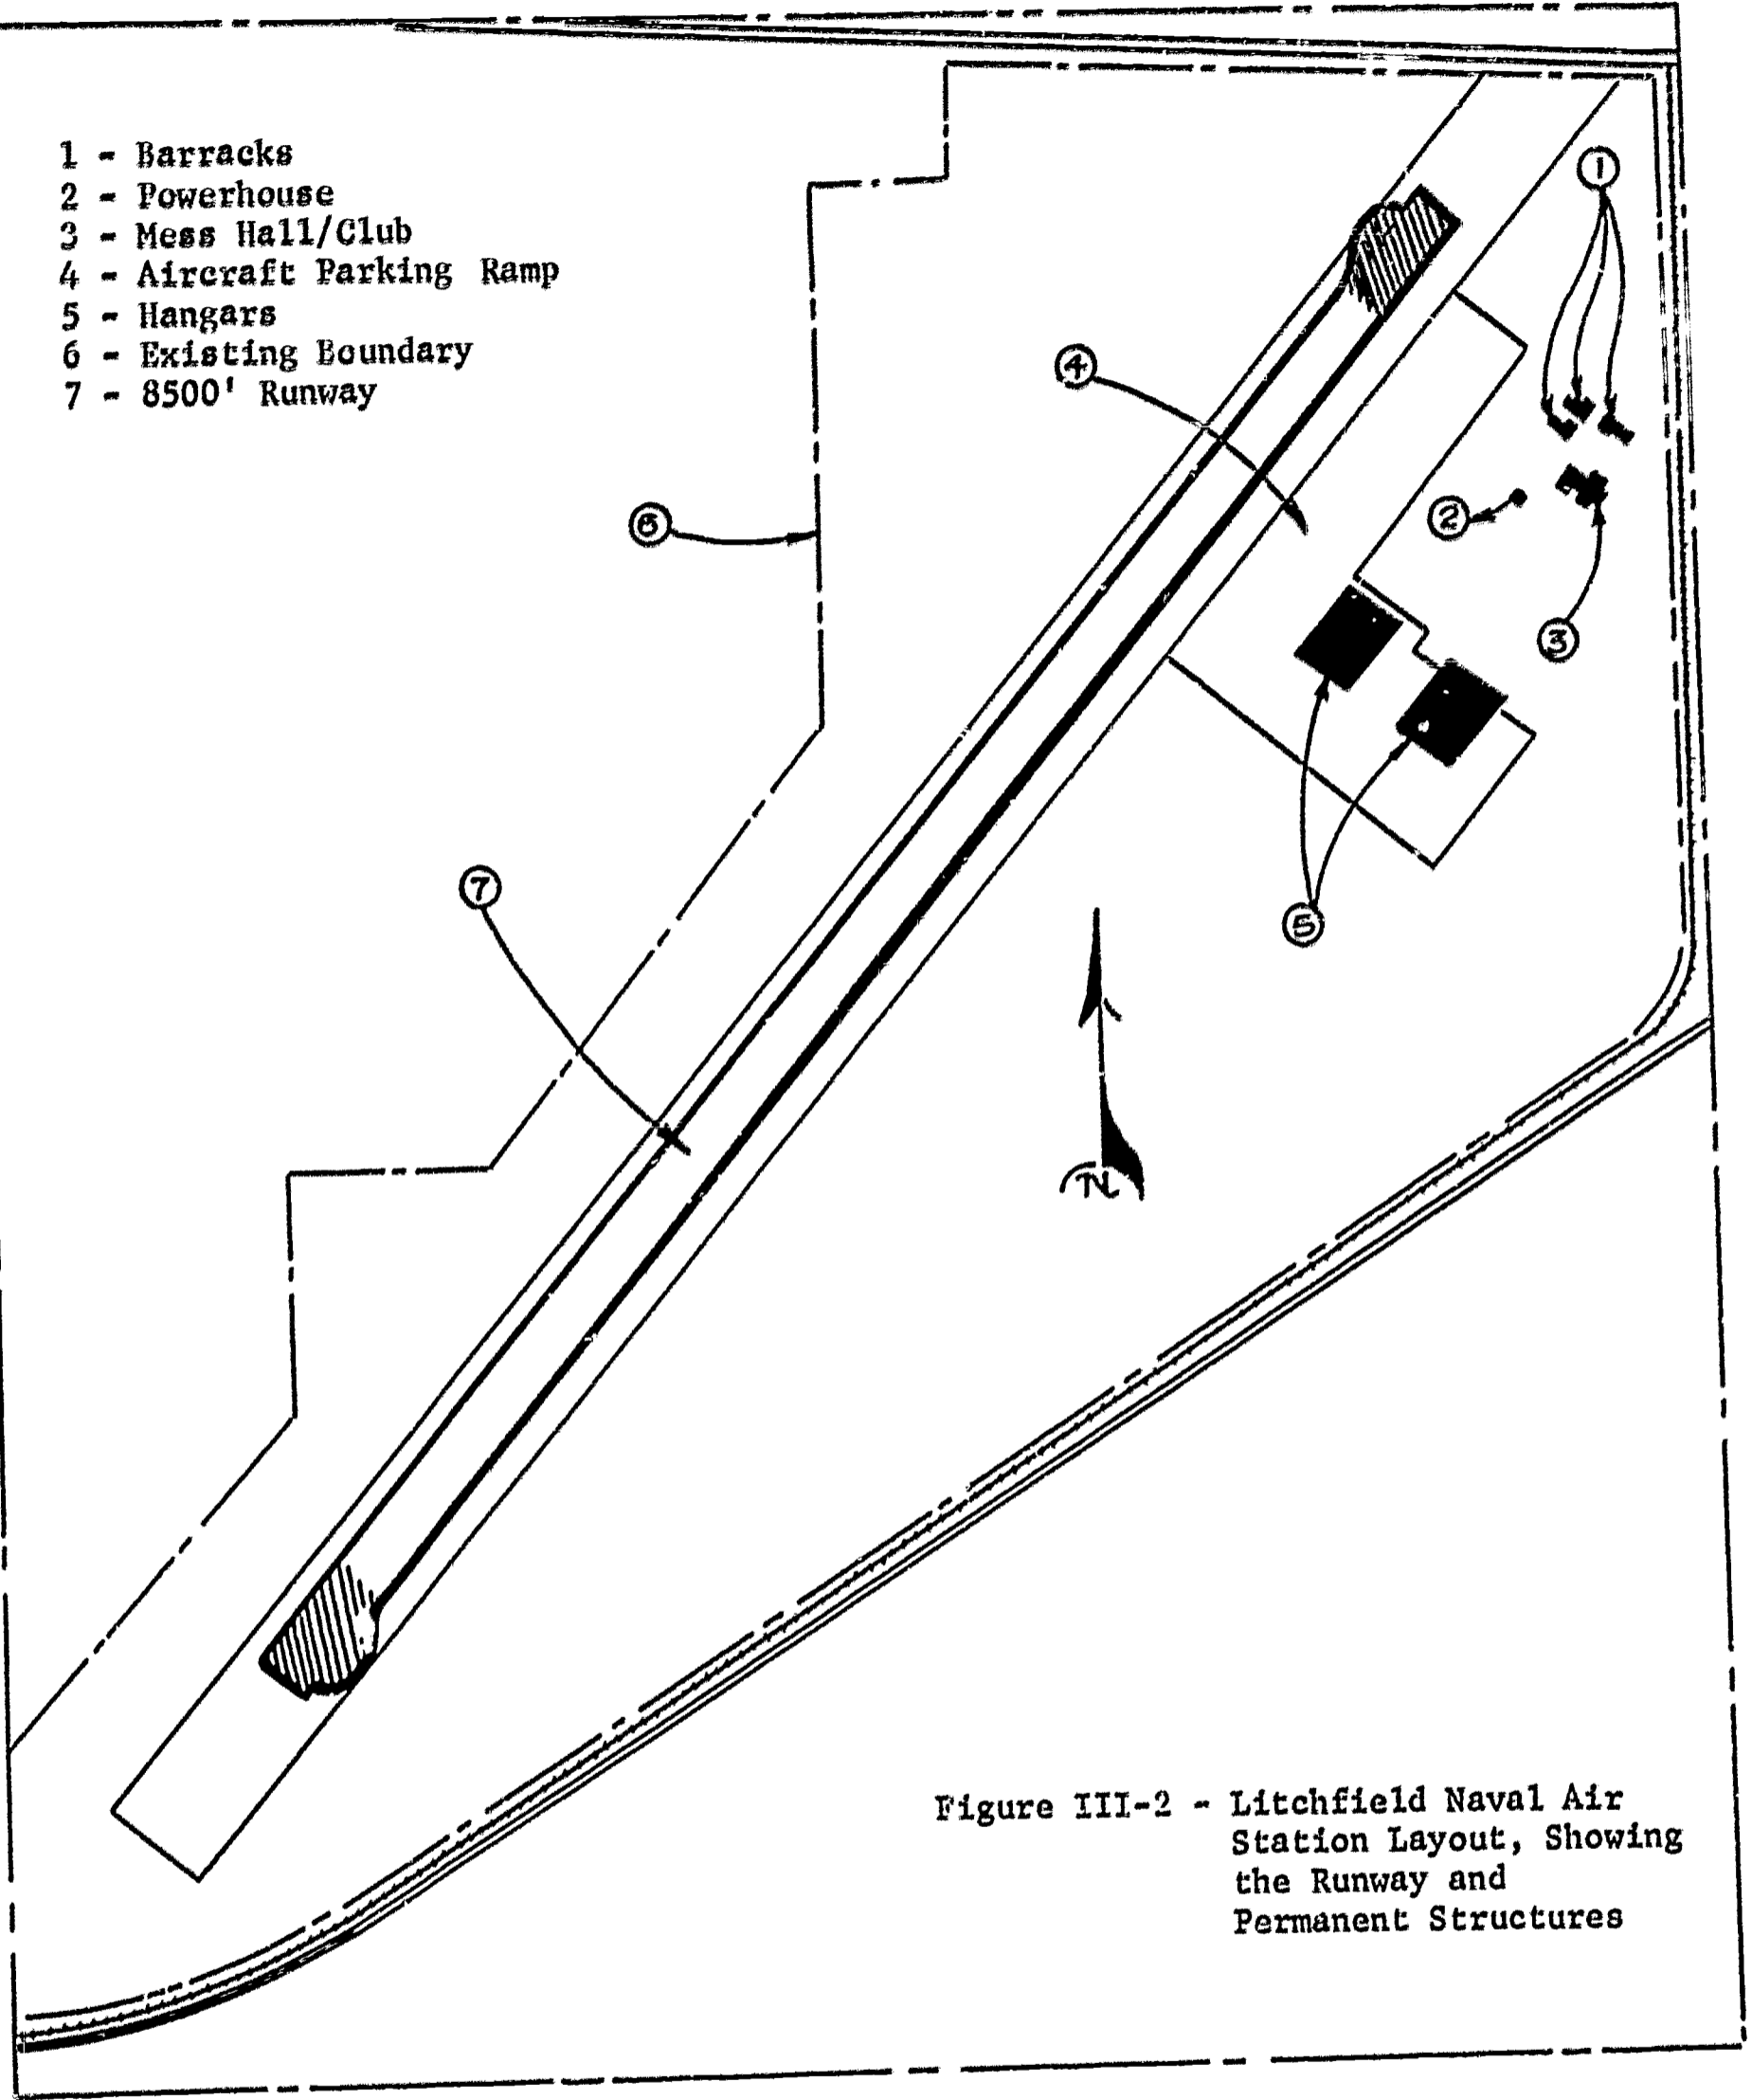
Litchfield Naval Air Station Layout, Showing the Runway and Permanent Structures
